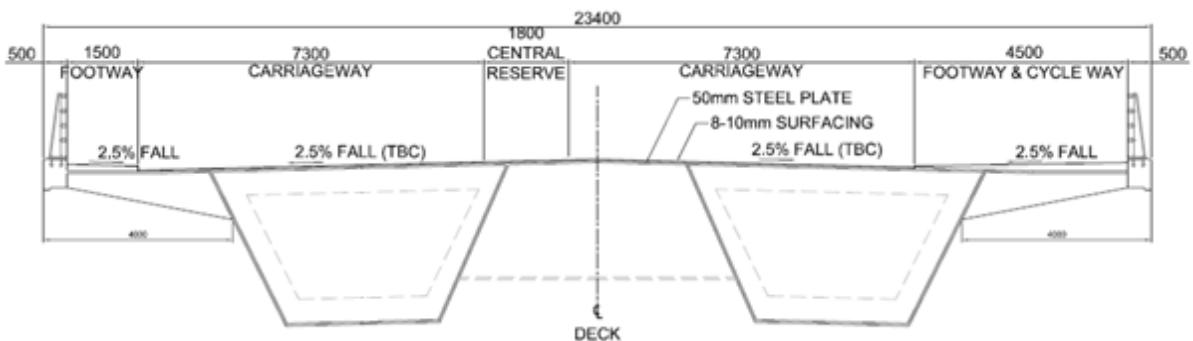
Trapezoidal box girder arrangement deck (adapted Mouchel/WSP report)
